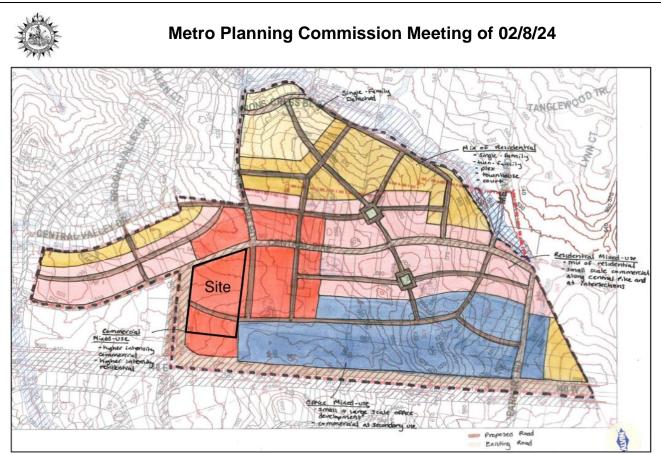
SPA 14-T3-CM-01 Central Pike Concept Plan
